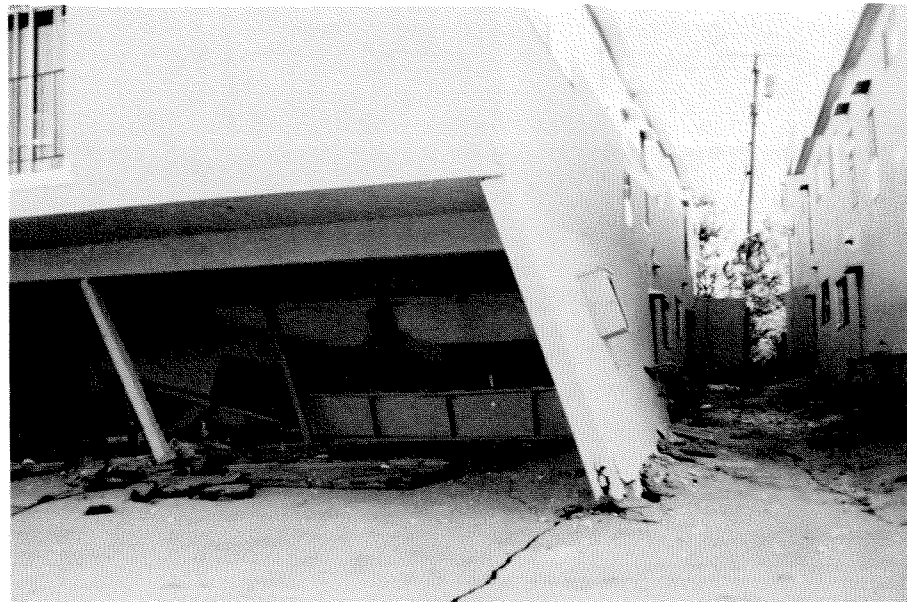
Wall displacement, rear of northwest building, Mardette Apartments.
